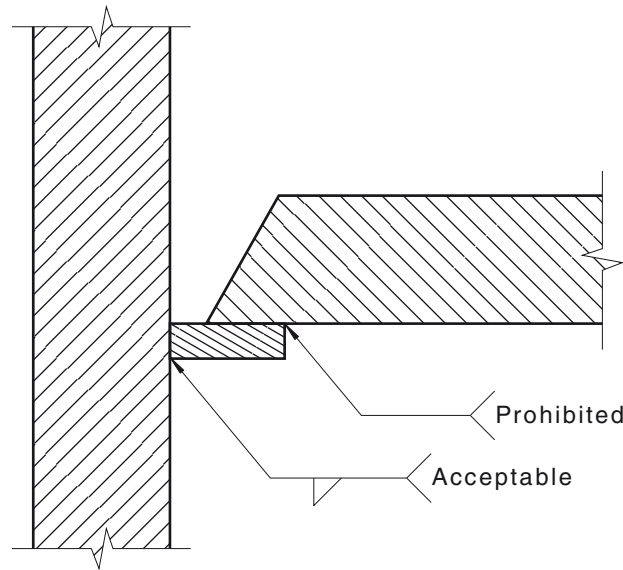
WELDED CONNECTION FOR BEAM FLANGE TO COLUMN WITH PERMANENT STEEL BACKING.
